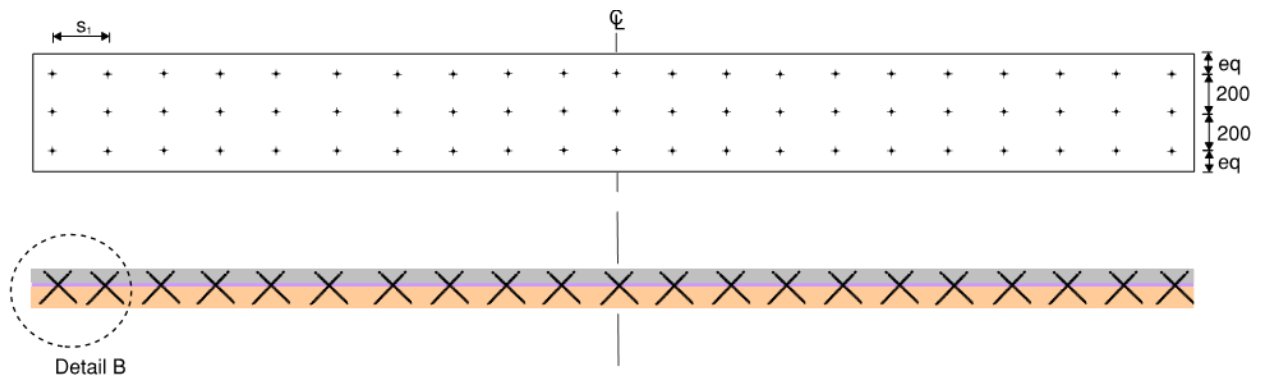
Layout of typical panel with pairs of inclined STS through rigid insulation (Type 2)
